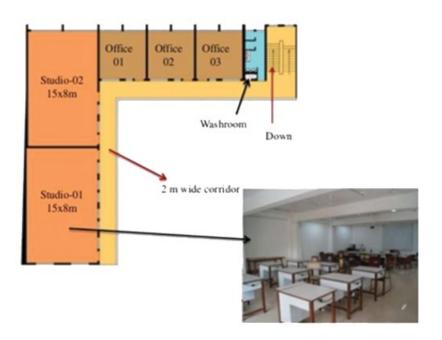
FIRST FLOOR PLAN OF NEW BLOCK
